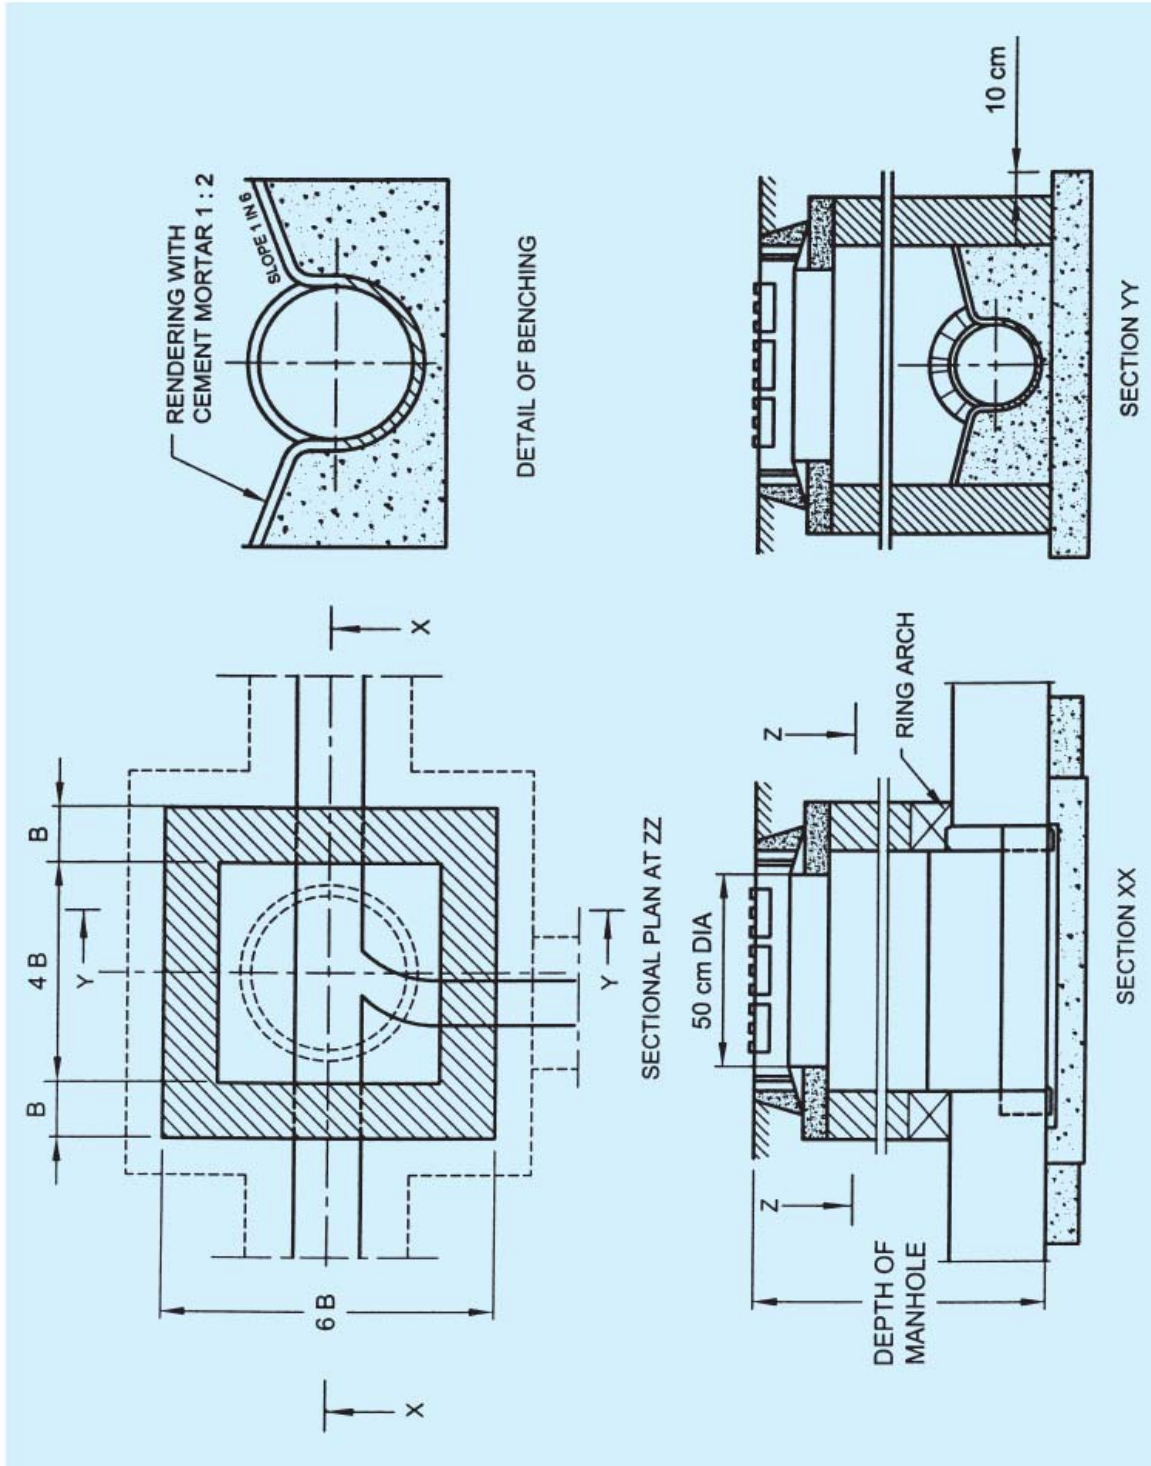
DETAIL OF MANHOLE (DEPTH LESS THAN 0.90 M)
